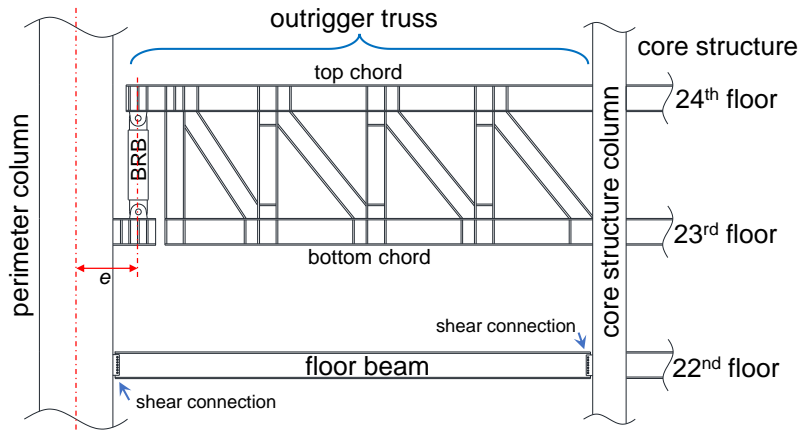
Enlargement of the BRB-outrigger detail in the 32-story MBM model
